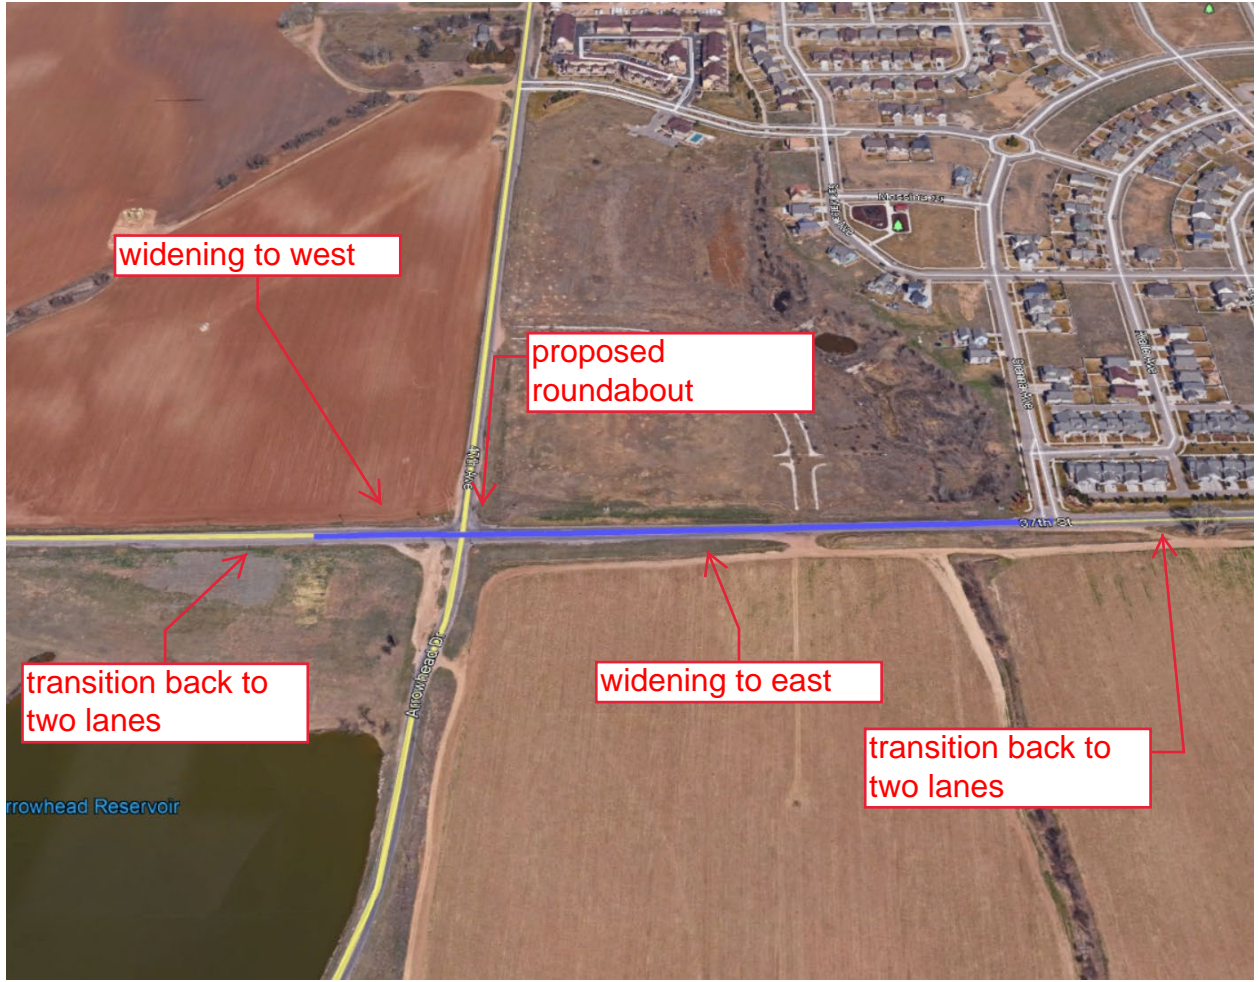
limits of 37th Street and 47th Avenue Roundabout and Widening
